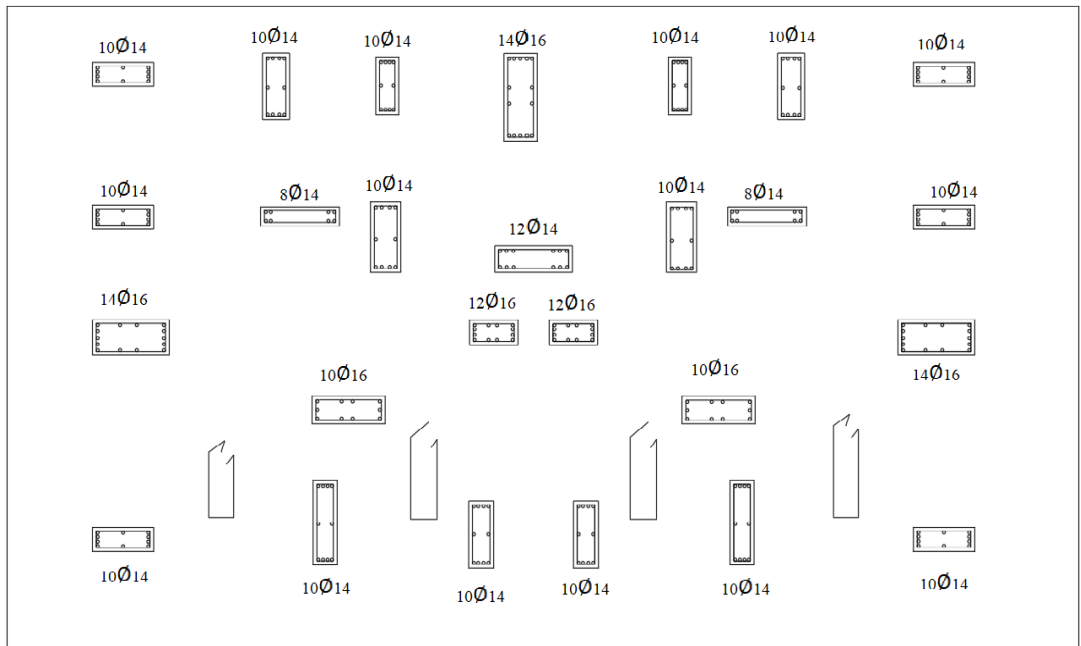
Reinforcement rebar of columns of second, third and fourth floor
